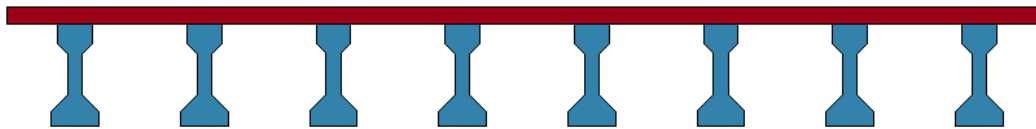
Cross-Sectional View of Archetype 3 Bridge Model.
